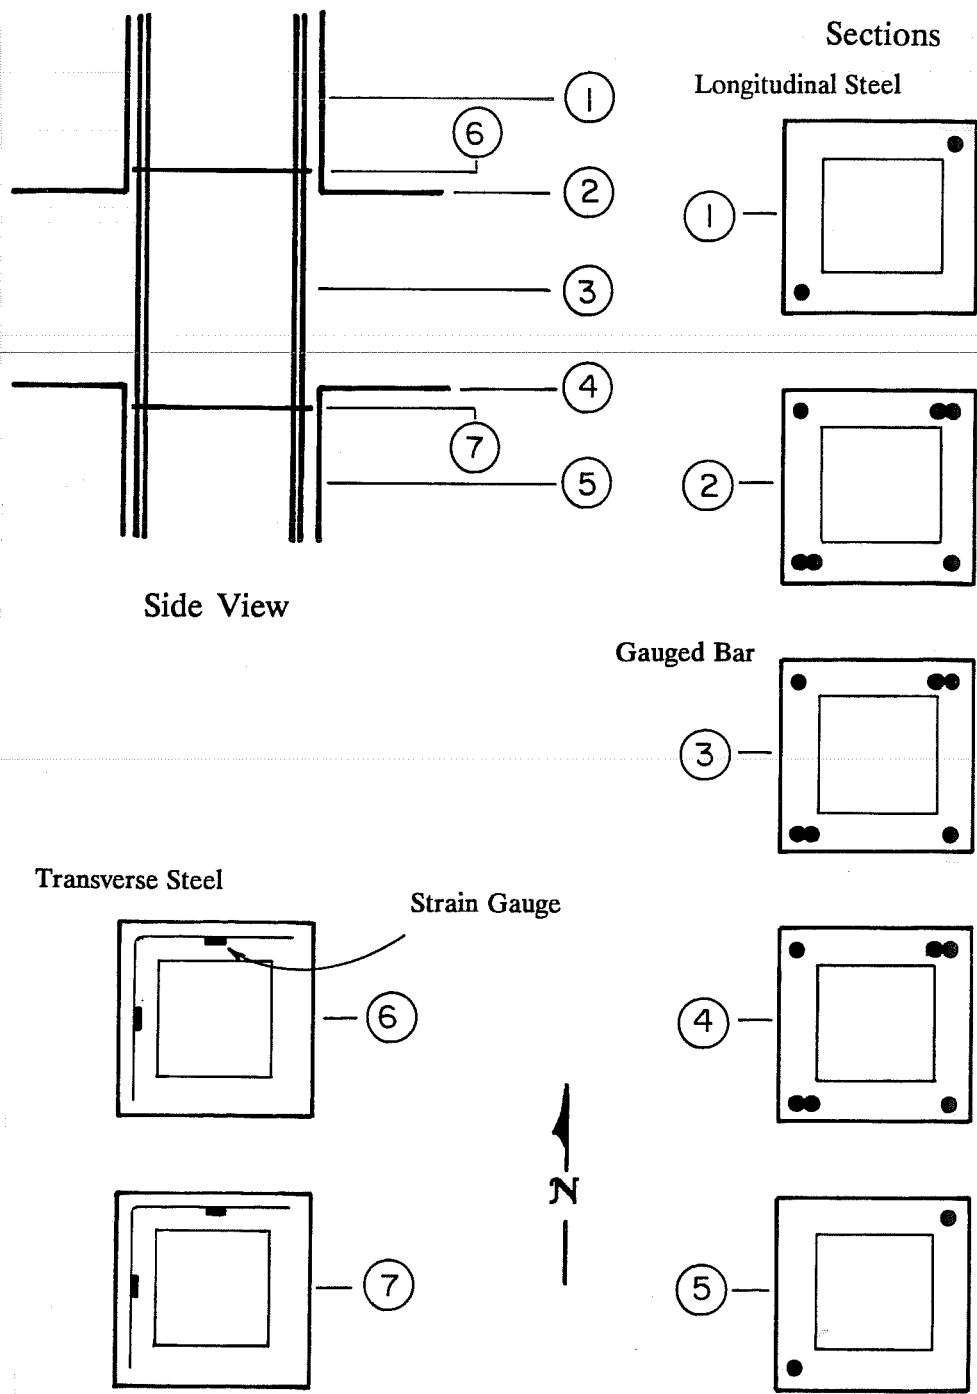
Jacketed Column Specimens RB and SB - Strain Gauge Location
